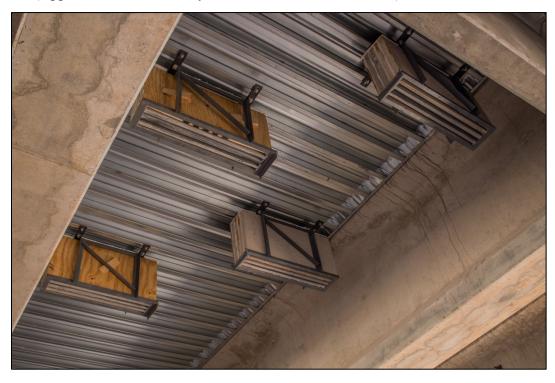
Bat roosts installed on a bridge in Arizona as an example of those installed on a bridge in NC for gray bats. (Photo taken by Melina Zuniga and used with permission from Cronkite News)
